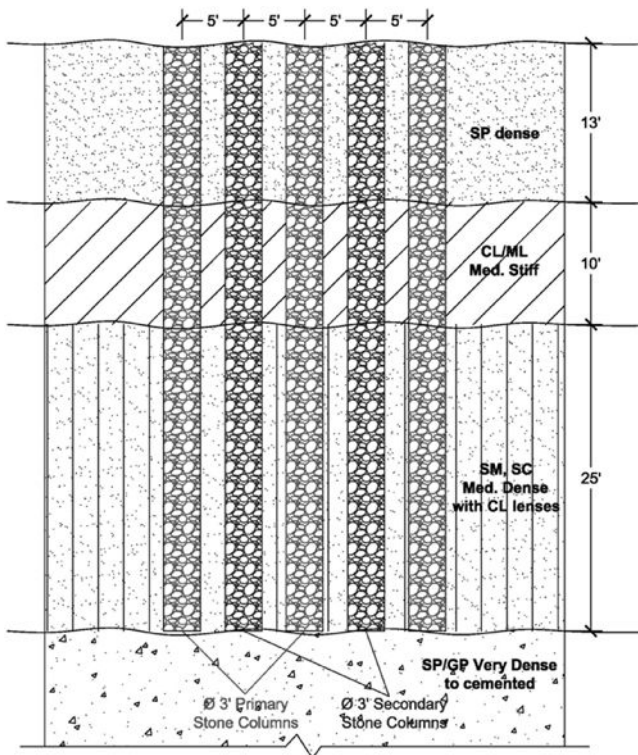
Typical soil profile with stone columns under the church building (by courtesy of Hayward Baker Inc)
